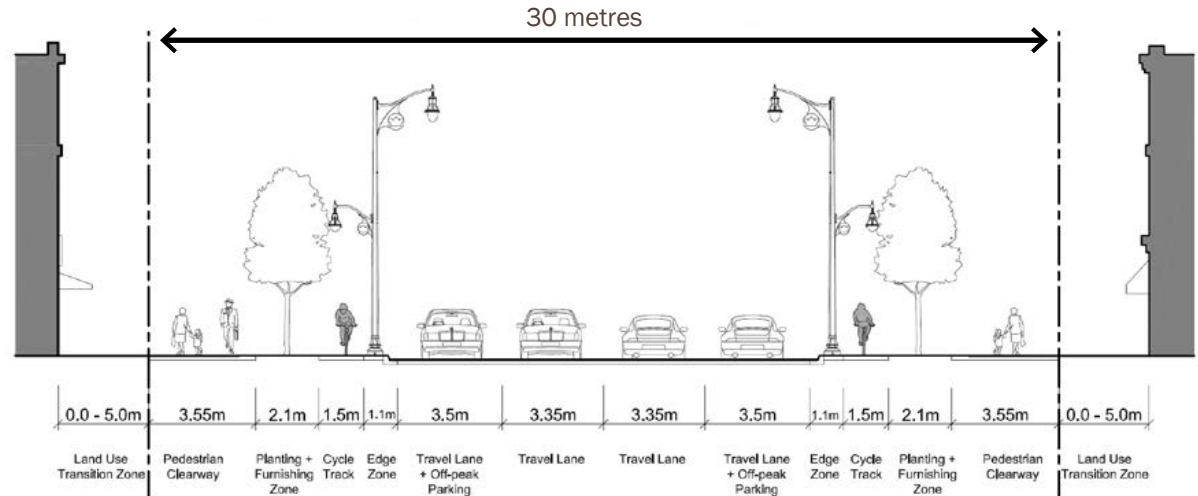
Primary Street Sample Section from the Downtown Streetscape Manual. This section illustrates a 30.2 metre right-of-way while Elizabeth Street is a 20-metre right-of-way that is planned to be widened to 24 metres)
